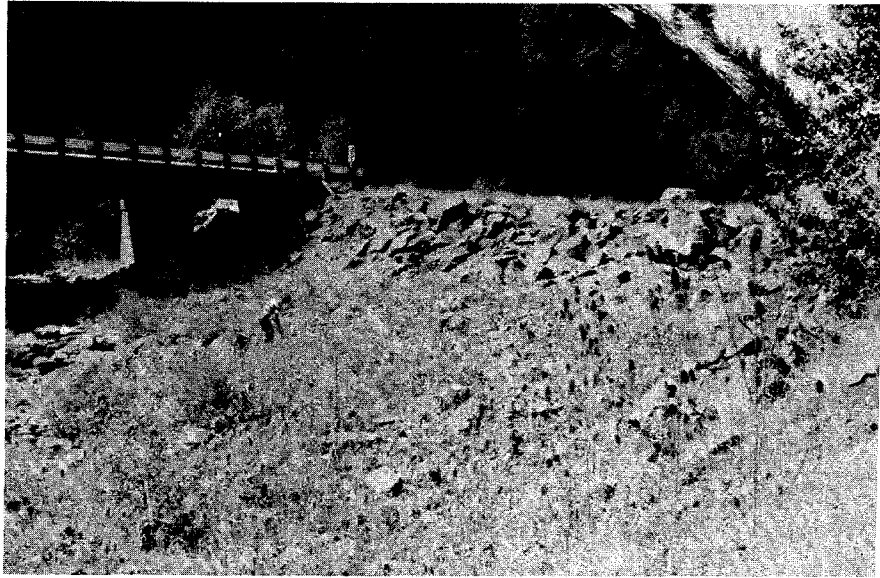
Details of bank protection constructed in 1965 on Lapwai Creek.
